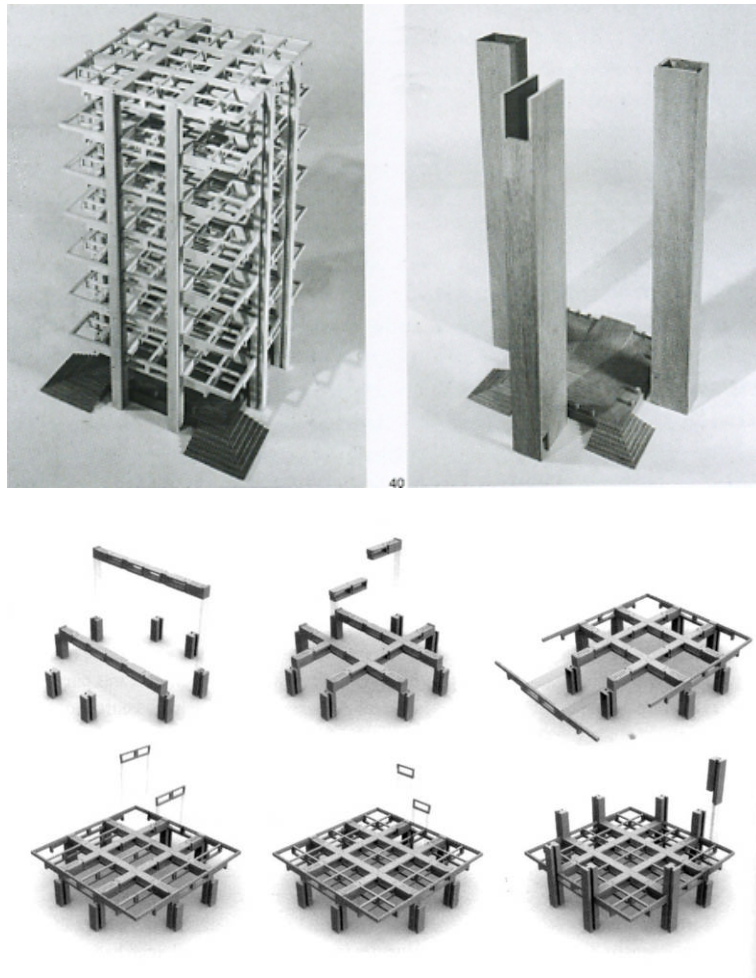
Structural innovation in concrete and brick service towers, Richards Medical Towers.
